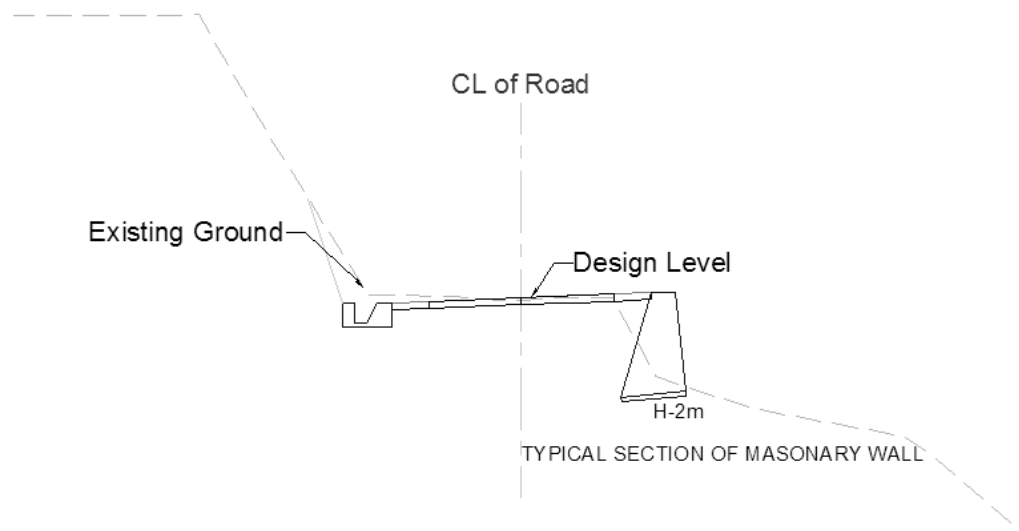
Typical Road Cross Section Showing Stone Masonry Wall
